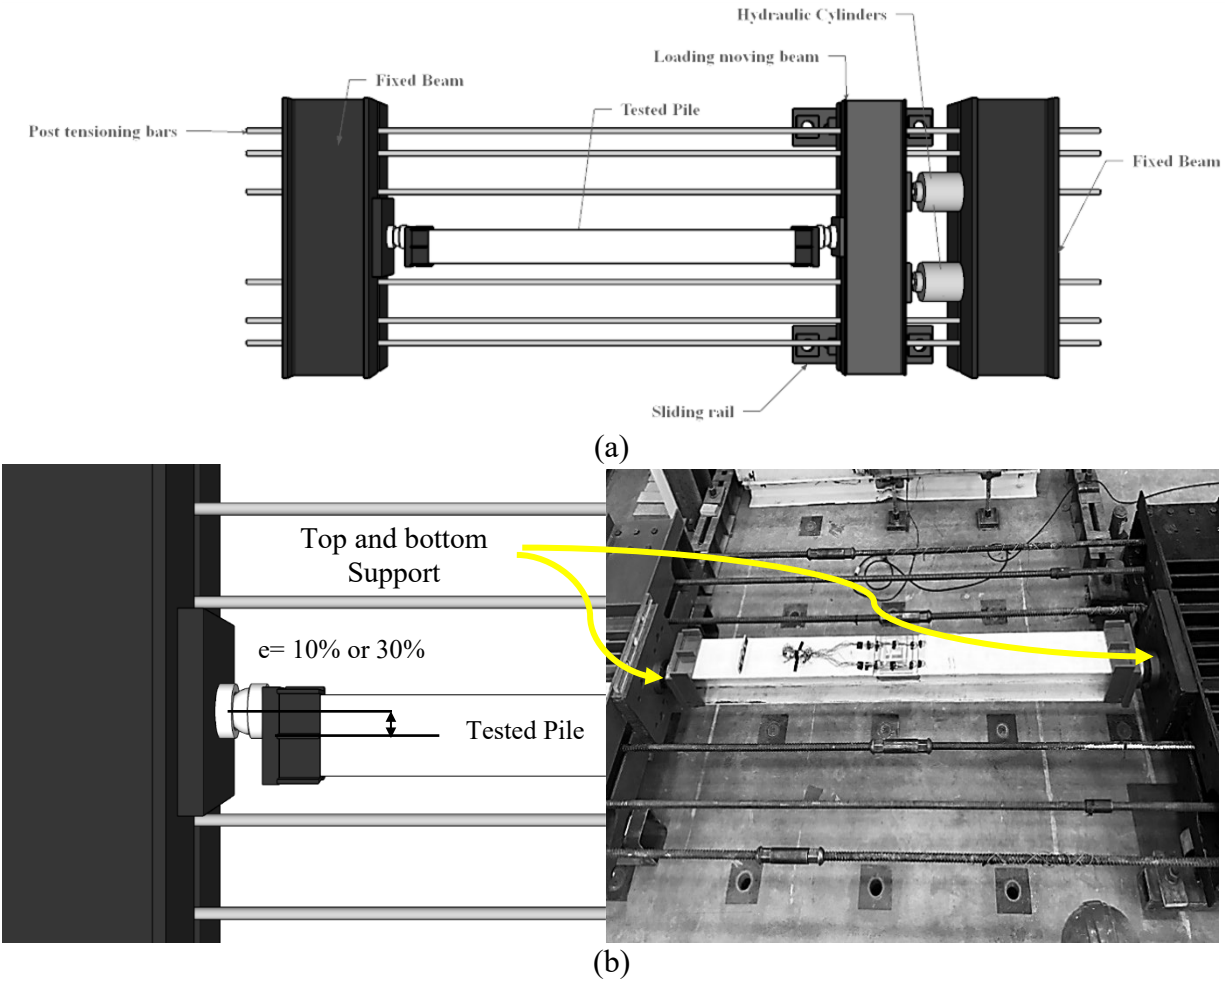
Test setup: (a) drawing, and (b) picture.
